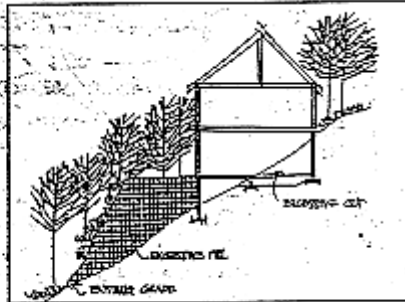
NO: Buildings shall not be designed with extensive cut or fill.
